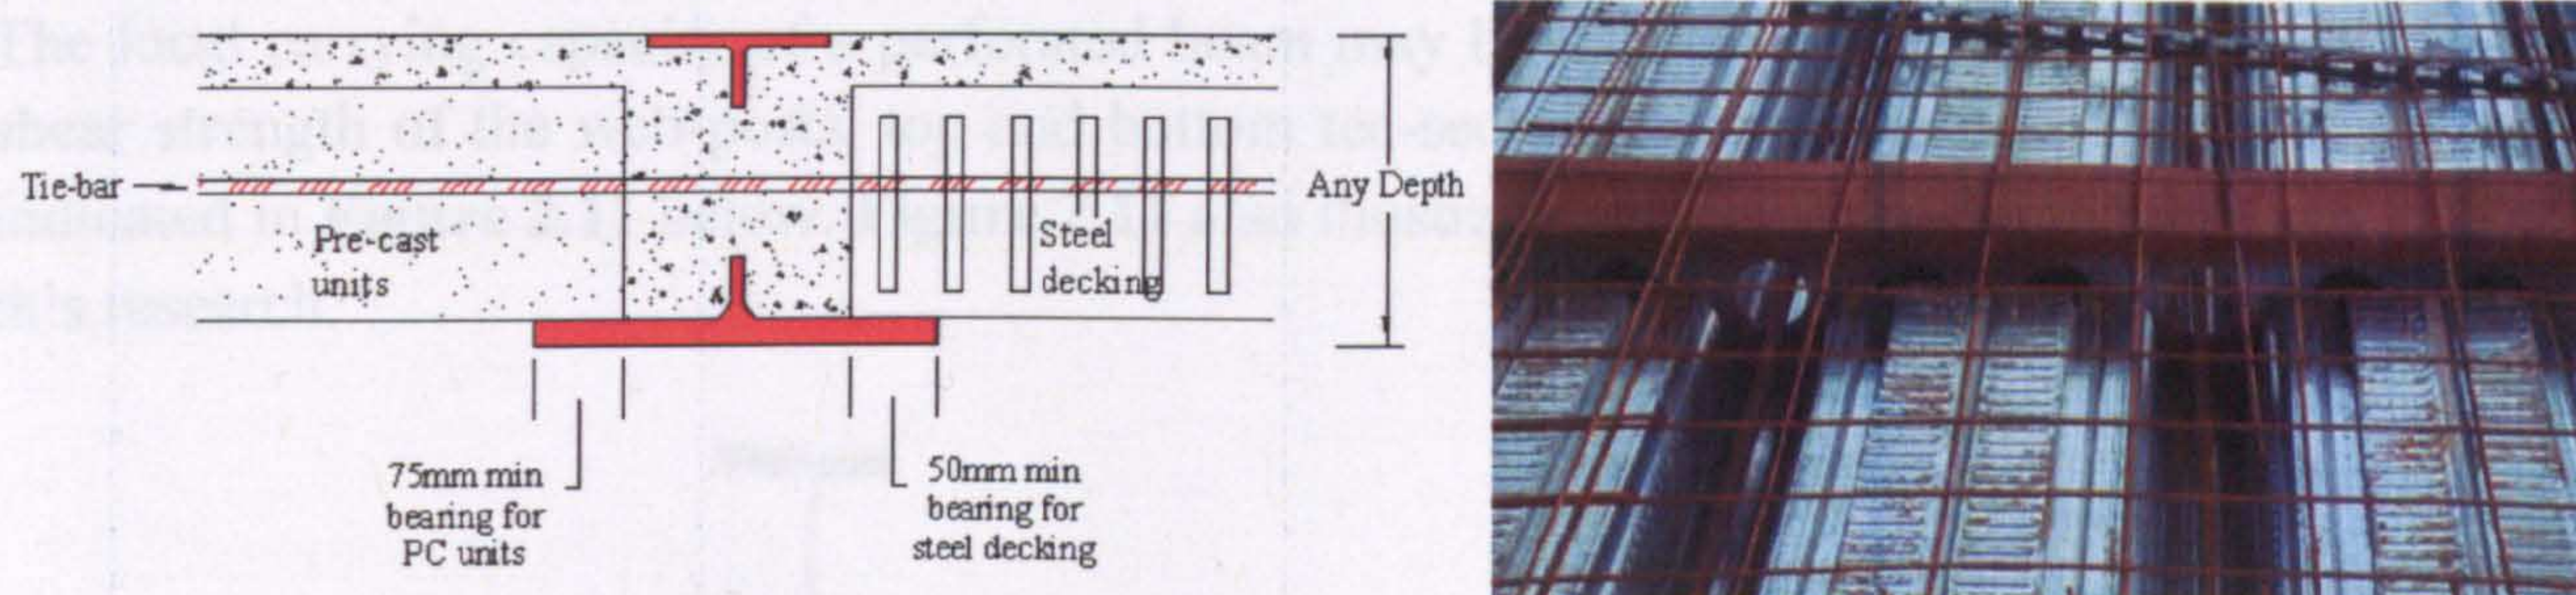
Cross-section configuration of the USFB (left) and deep decking floor application (right)
